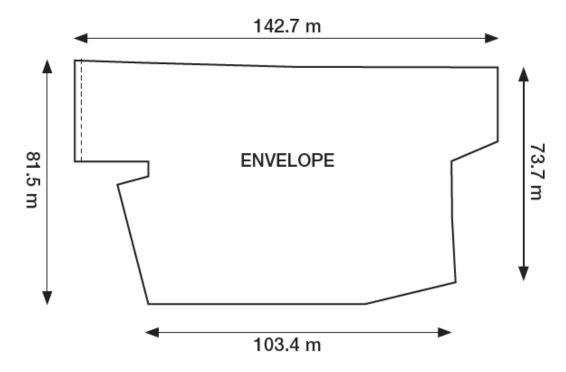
Block B site boundary. (Source: Woods Bagot and Skidmore, Owings & Merrill [SOM] Architects)
